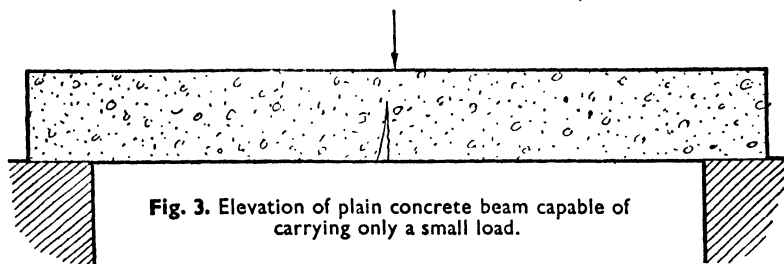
Elevation of plain concrete beam capable of carrying only a small load.
